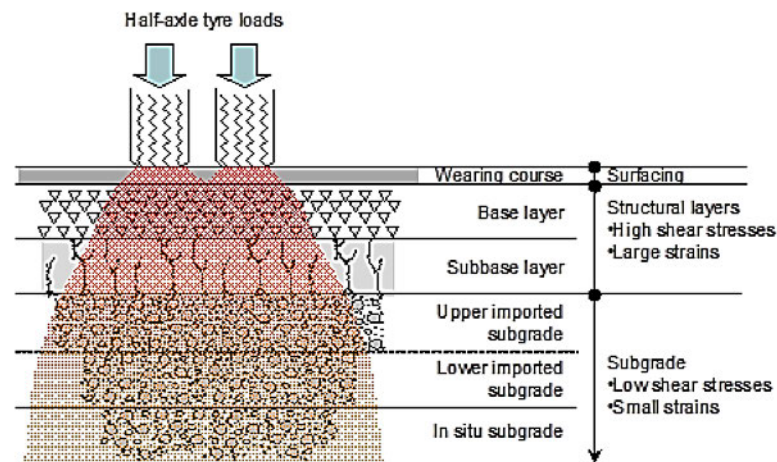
Typical stress distribution in a flexible pavement (Source: SAPEM, 2013e)
